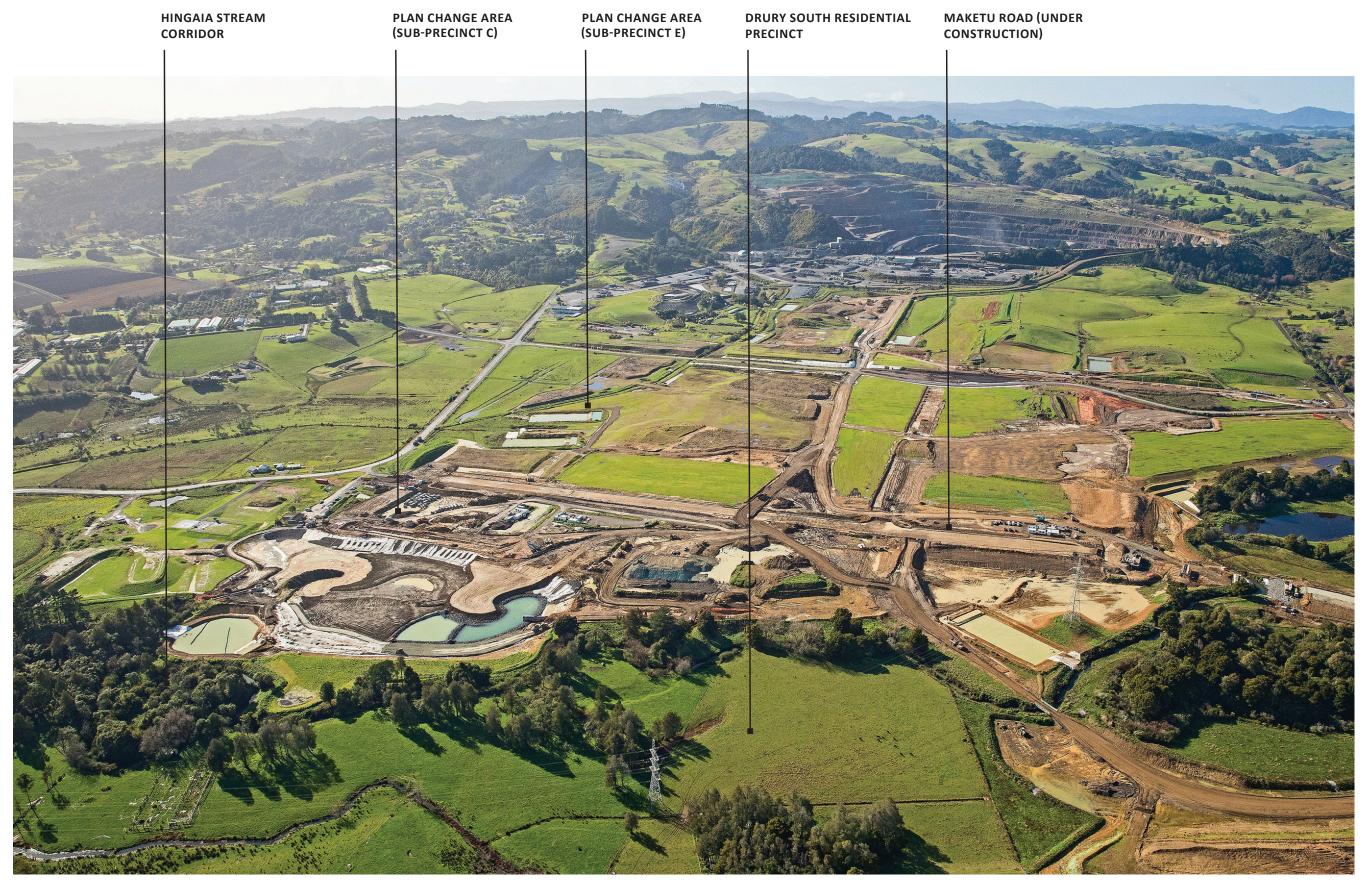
[PHOTO TAKEN BEFORE RECENT SITE EARTHWORKING]
